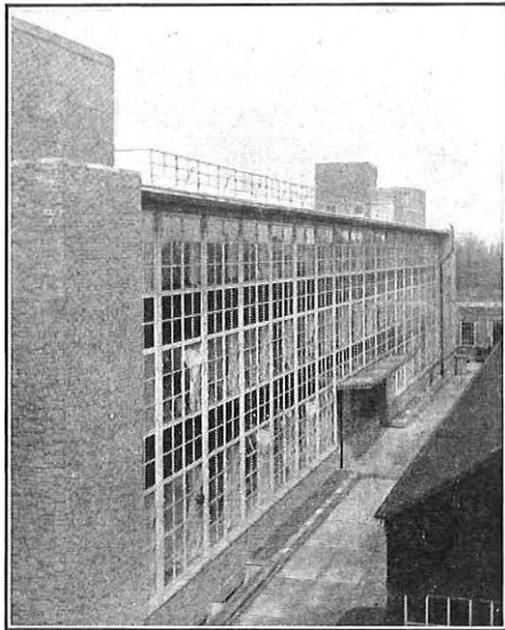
FRONT OF NEW WORKSHOP BUILDING.
